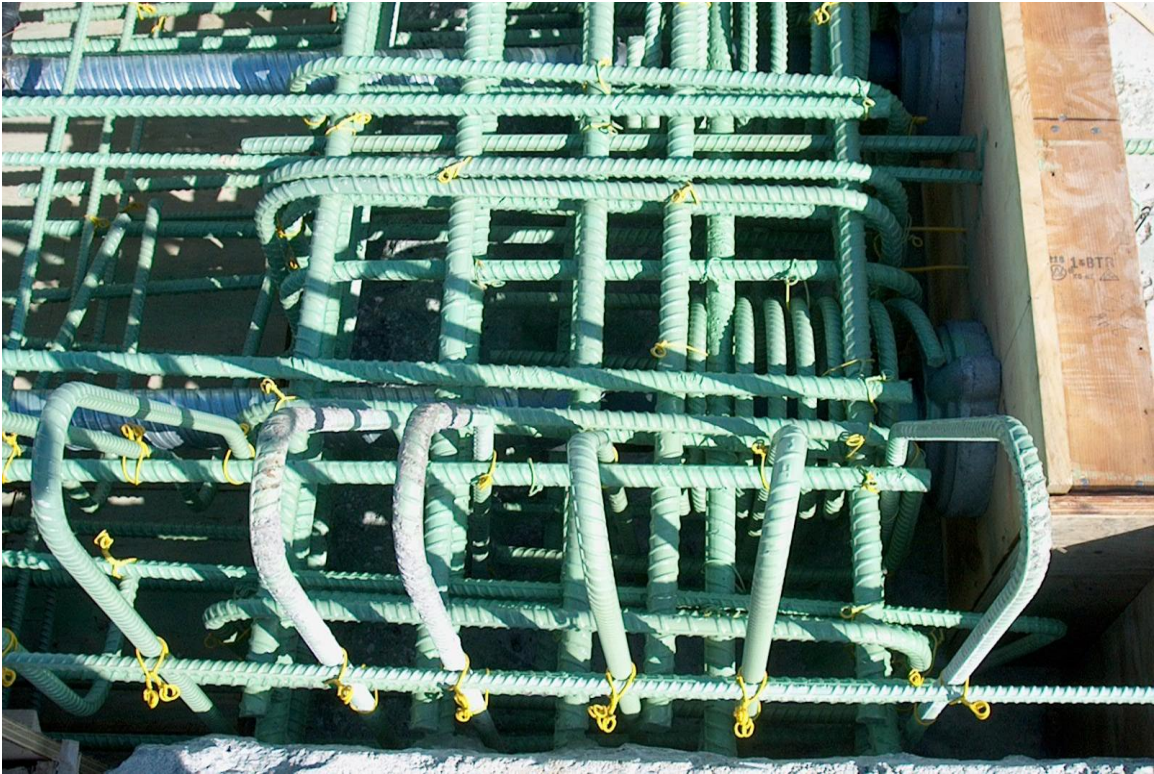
Close-up view of rebar congestion around longitudinal anchorage points (KDOT).
